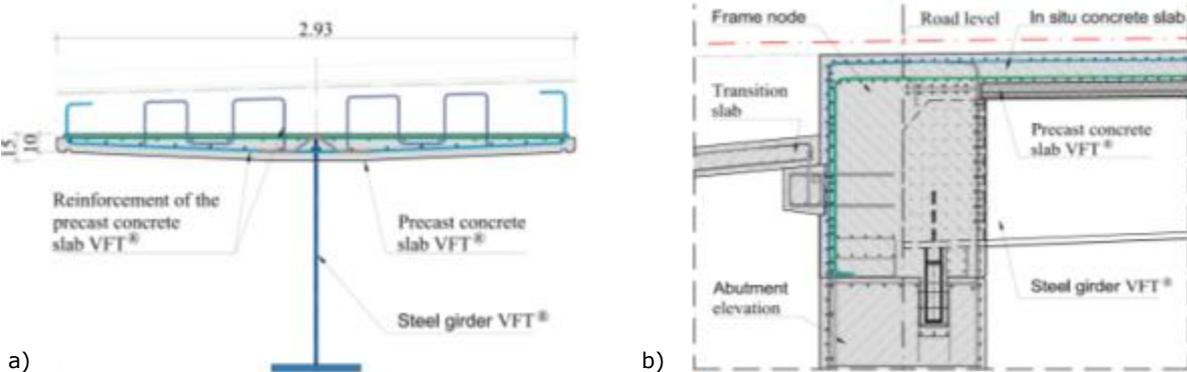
a) Reinforced cross section of the Prefabricated Composite Girder VFT®, b) Frame node reinforcement detail
